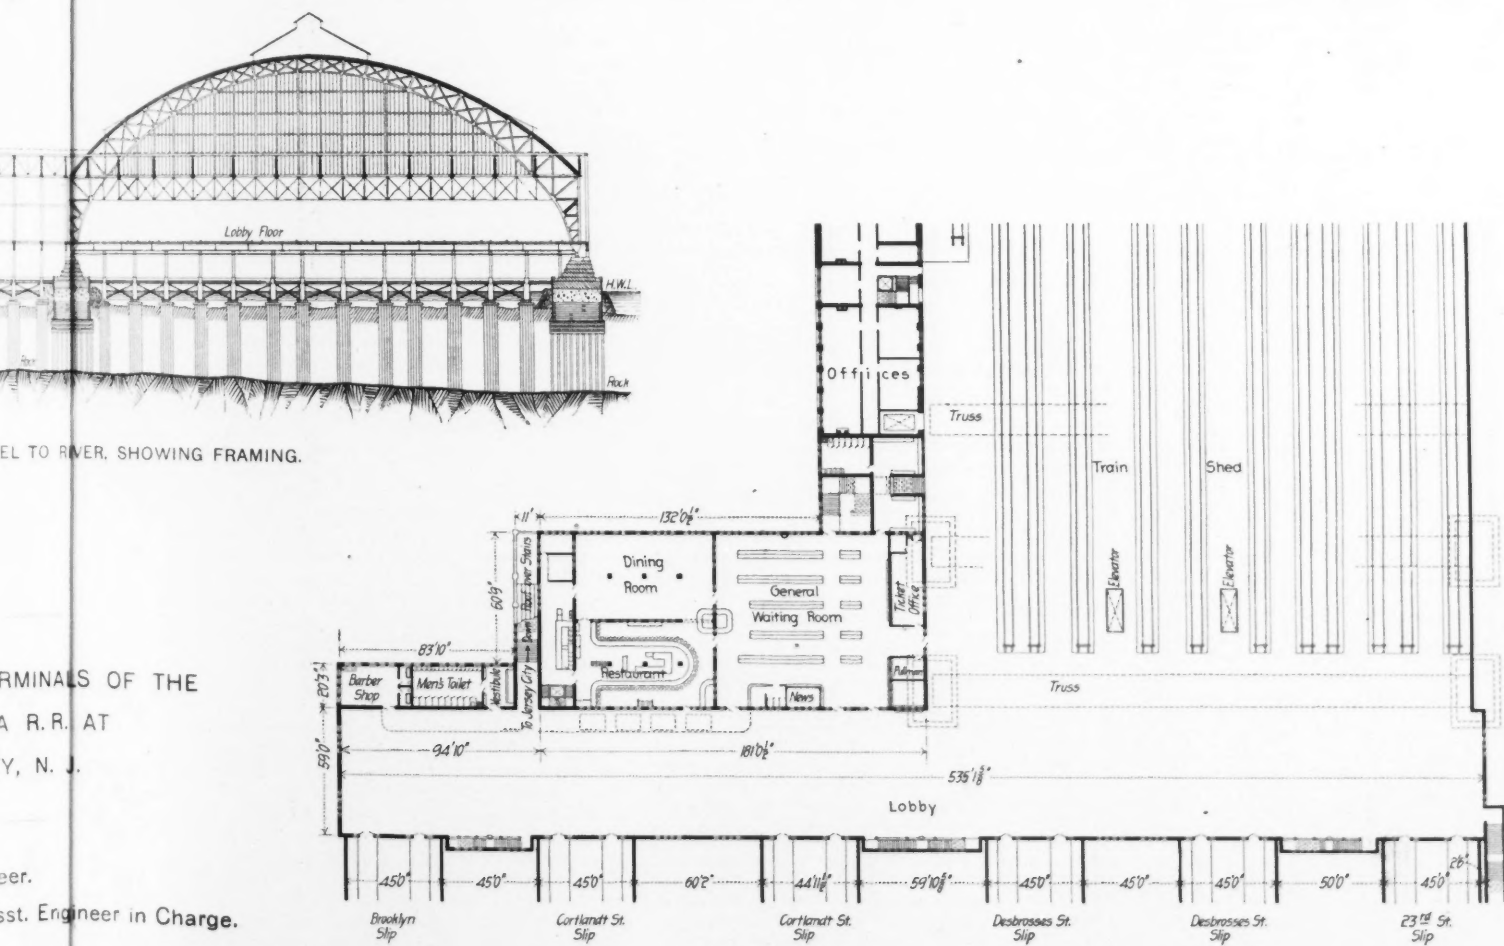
PLAN SHOWING ARRANGEMENT OF WAITING-ROOMS, ETC.
